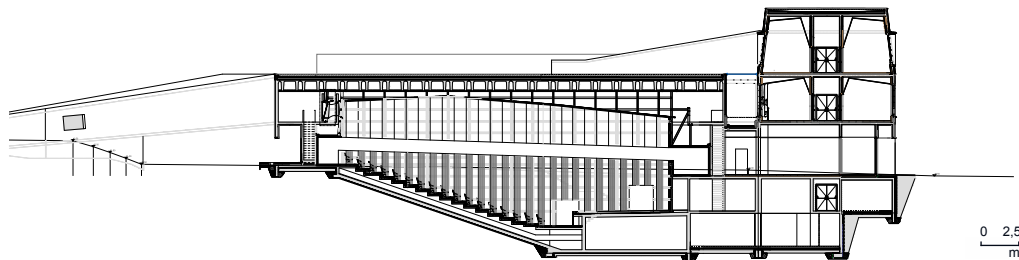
Quinta das Flores School's new building \_ Transversal section through the auditorium
